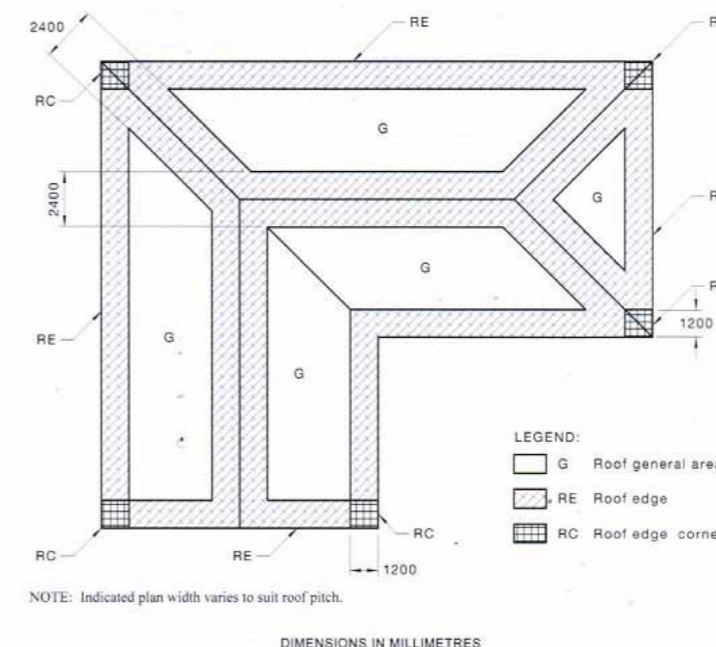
PRESSURE ZONES ON HOUSING—ROOFS (PLAN VIEW)
